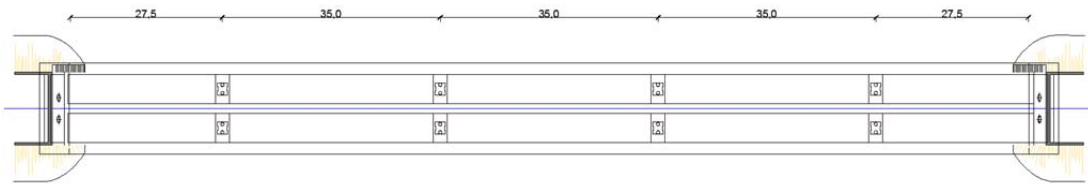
The longitudinal layout of the bridge has three spans of 27,5 + 35 + 35 + 35 + 27,5.
